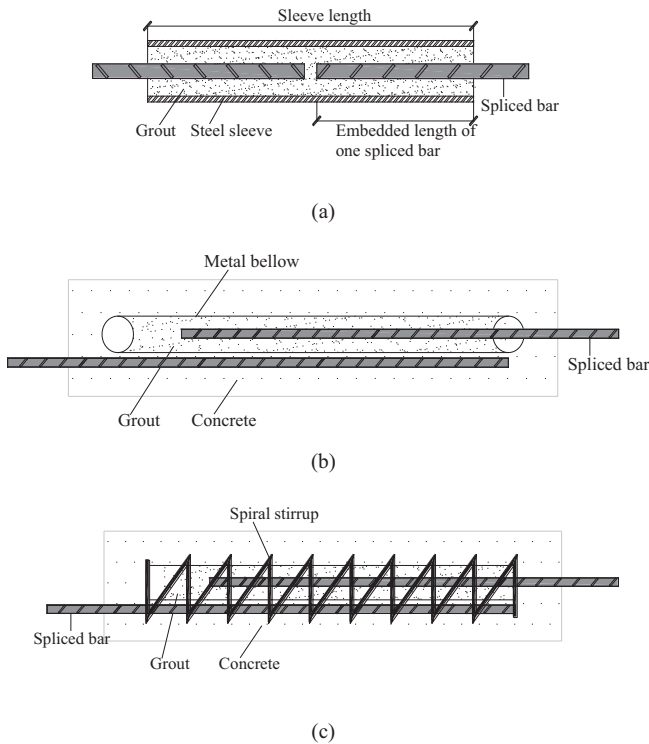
The vertical joints used in PC walls. (a) Grouted-coupling sleeve; (b) Lap-spliced joint by grouting metal bellow used in this paper; (c) Lap-spliced joint by restraint grouting-anchoring.
